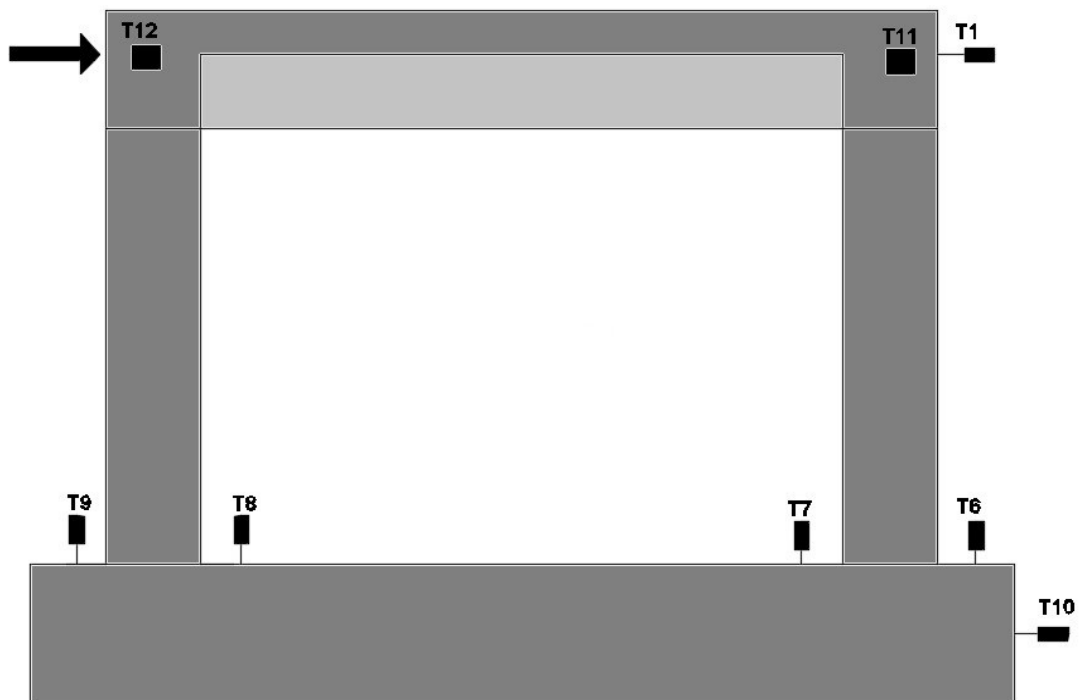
LVDTs used in test setup-view of specimen back side.
